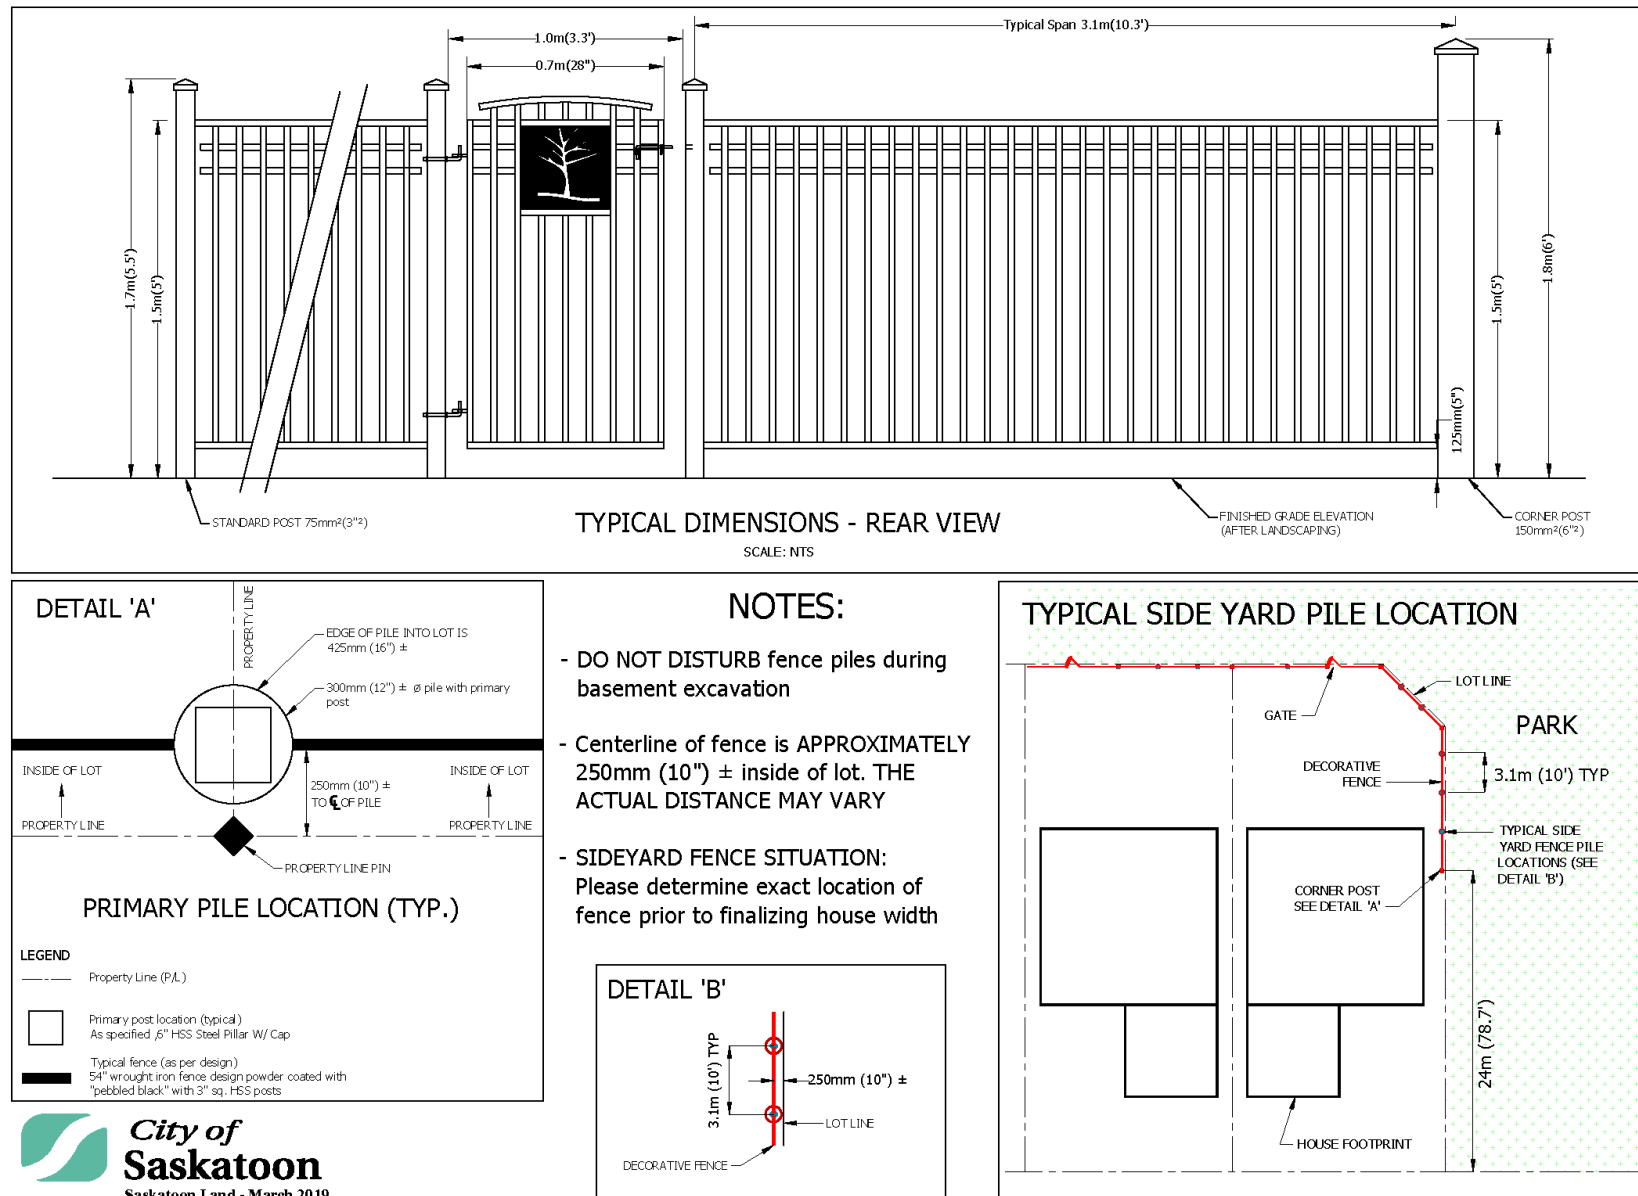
ASPEN RIDGE DECORATIVE FENCE DETAILS
